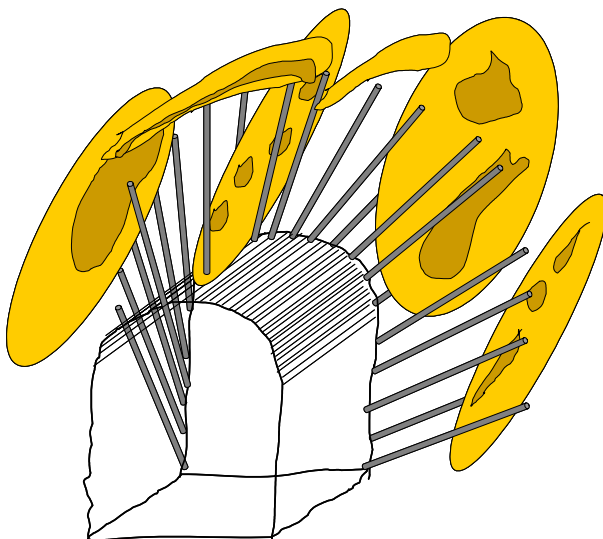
Illustration of a grout fan and the chance to intersect a conductive part of a joint plane.
